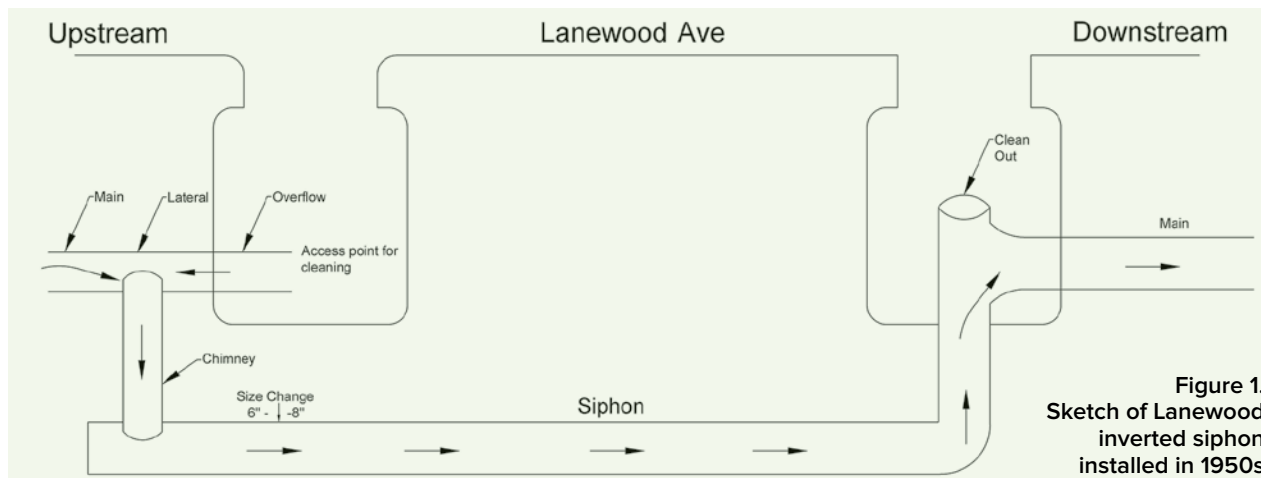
Sketch of Lanewood inverted siphon installed in 1950s
